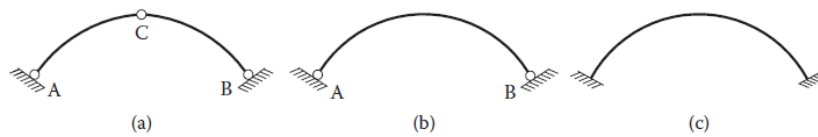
Connections of arch bridges, (a) three-hinged, (b) two-hinged, (c) hingeless [6]
